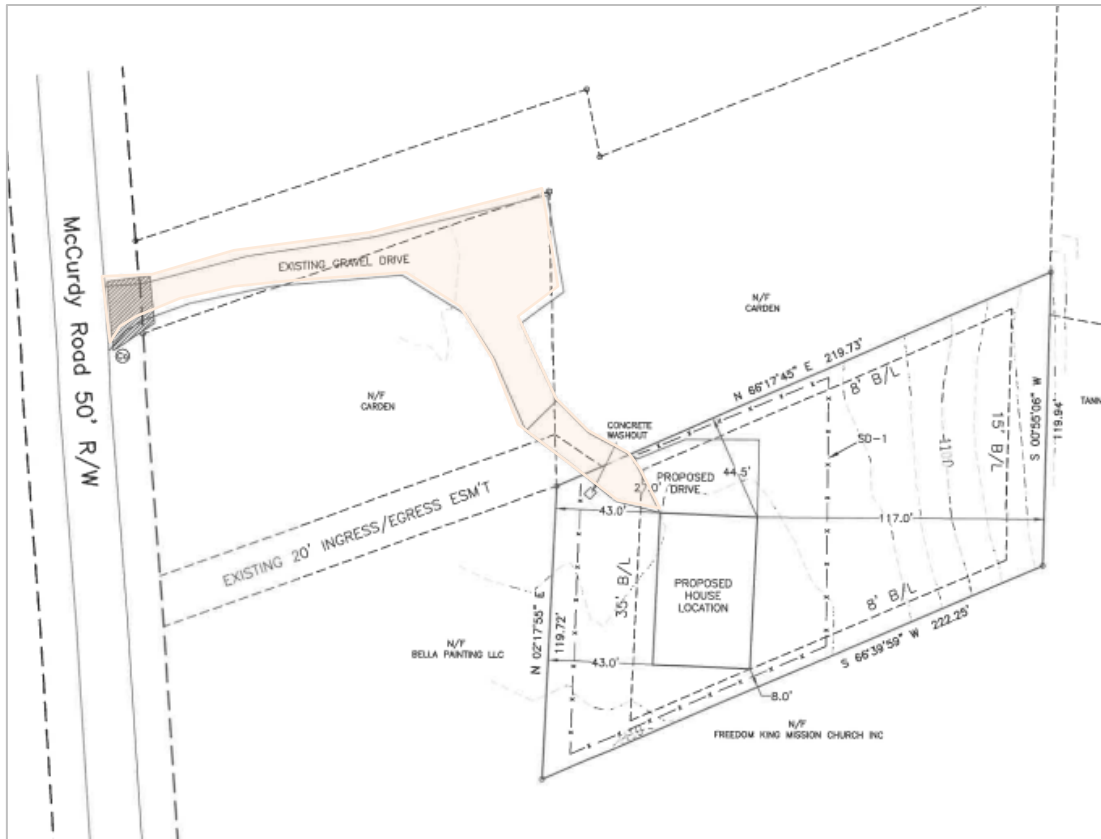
SITE PLAN AND SHARED GRAVEL DRIVE ACCESS HIGHLIGHTED IN ORANGE
